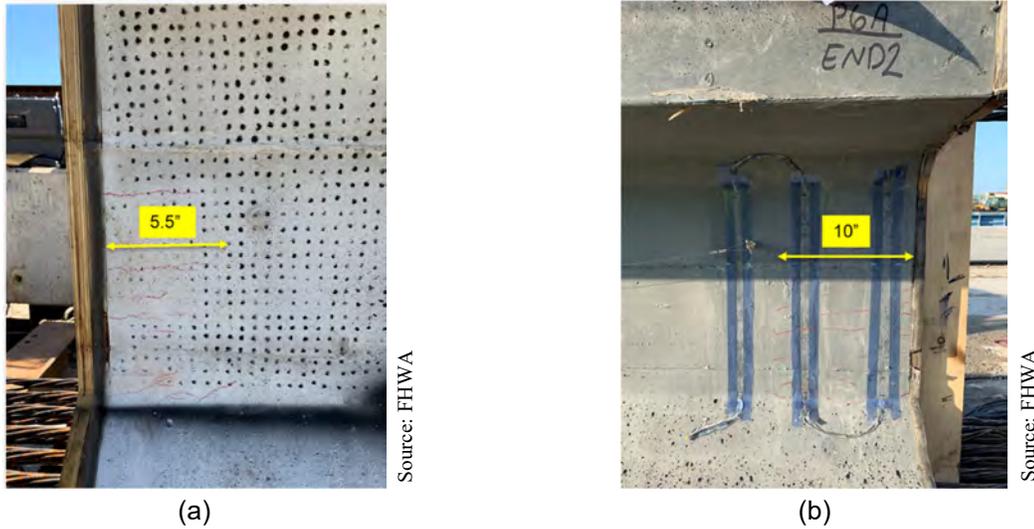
End zone cracking after release (a) Girder A (b) Girder B.
